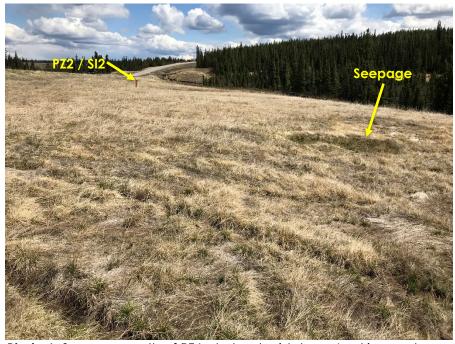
Seepage south of PZ6 at about mid-slope. Looking east.
